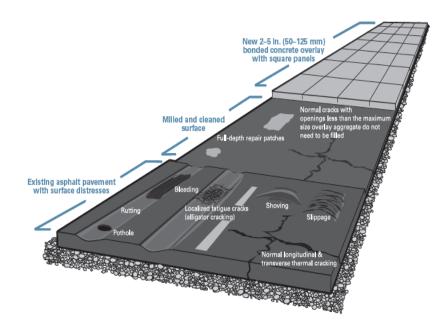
Notable distress on existing pavement and possible repairs for bonded whitetoppings [4]
